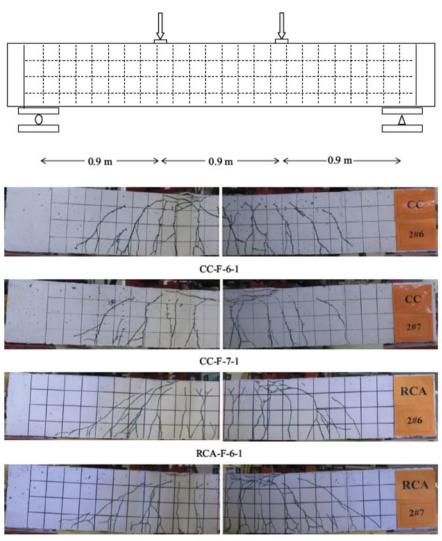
Crack pattern of both conventional and recycled concrete beams at flexural failure (*Source* Arezoumandi et al. 2015)
